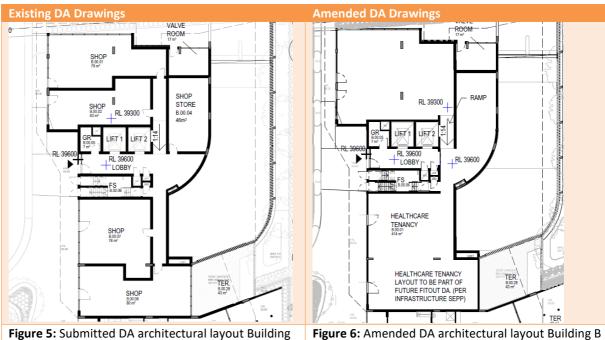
Submitted DA architectural layout Building B Ground Floor Level
